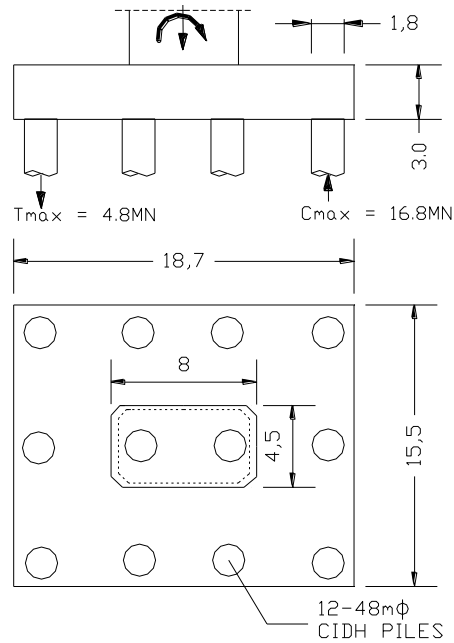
, – General dimensions of column section and pile cap (plan and elevation)
